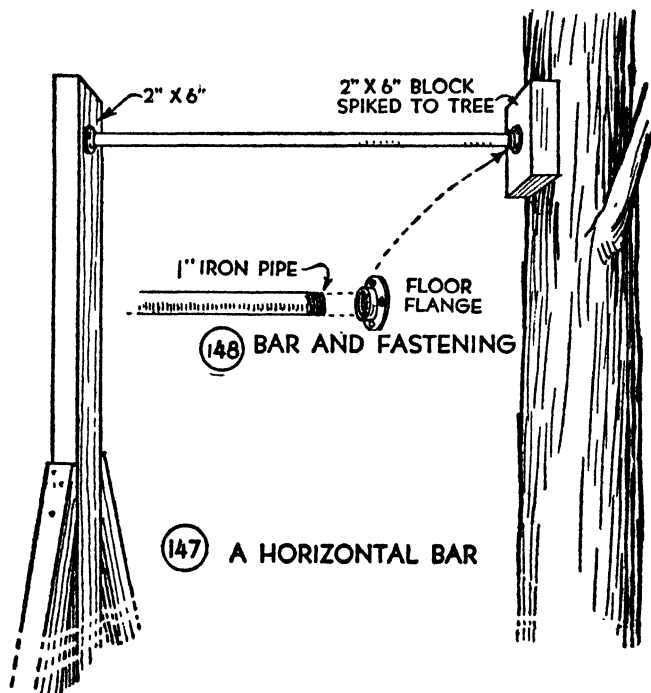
IF YOU WANT A HORIZONTAL BAR IN ADDITION TO THE TRAPEZE, ERECT IT THIS WAY
